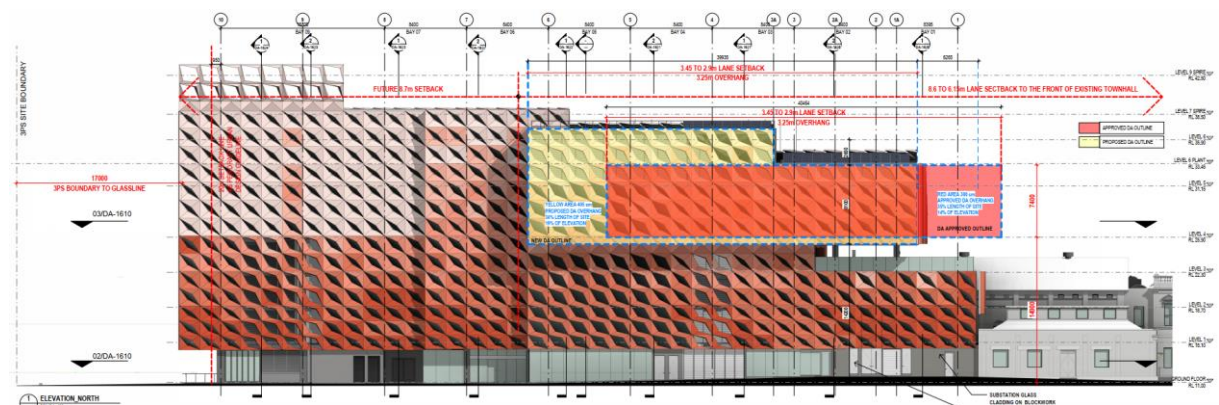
Northern Elevation showing laneway overhang as proportion of façade – proposed (yellow) and approved under DA/758/2017 (red) (Source: extract of DA-1610)
